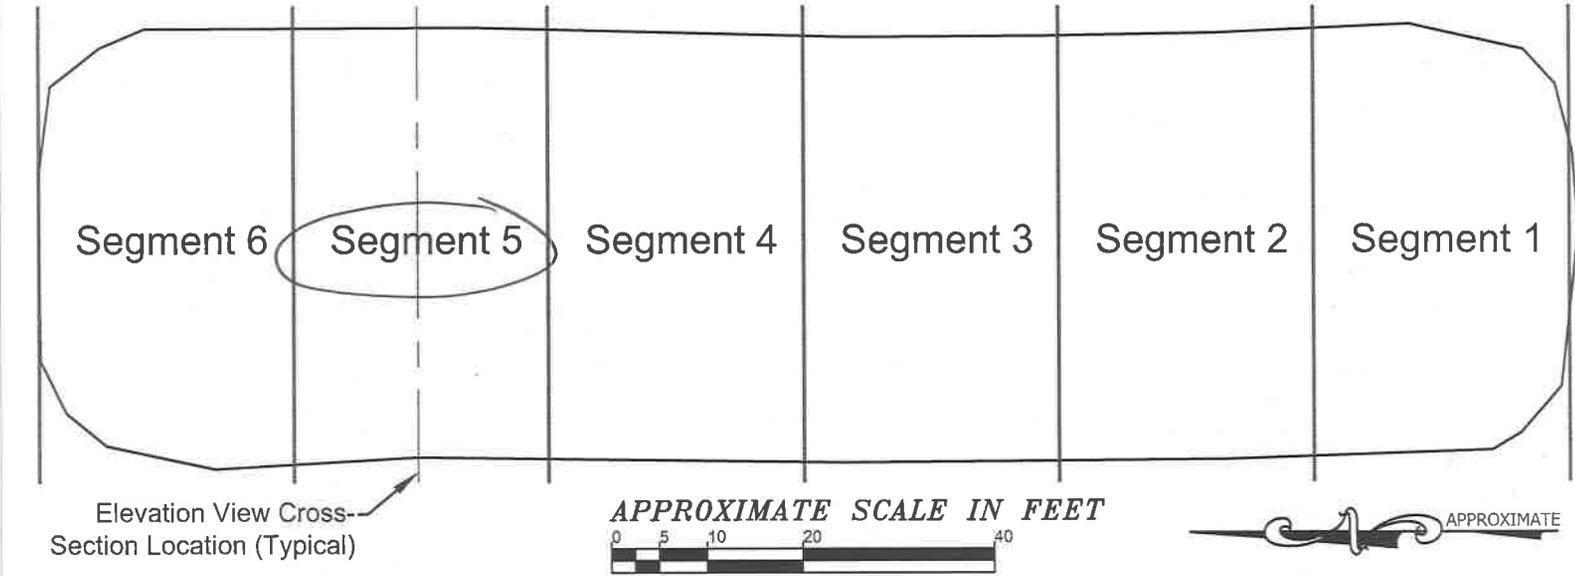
Stockpile A Layout & Proposed Sample Locations
